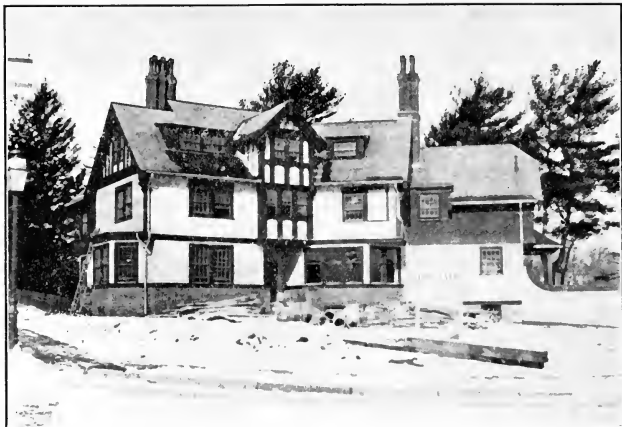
PLATE XXXIII. Appearance of house and grounds open to street after grading and before planting.
